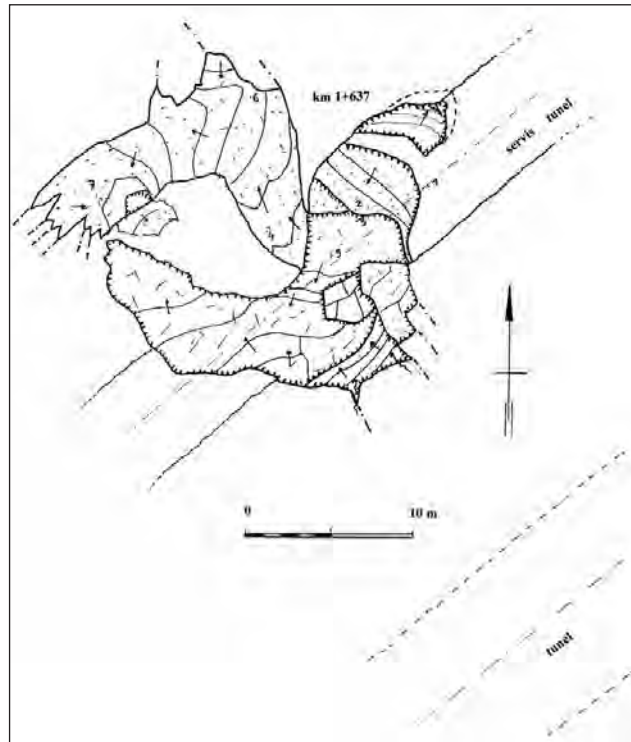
Cave plan of cavern at km 1+637 in Biokovo tunnel.
